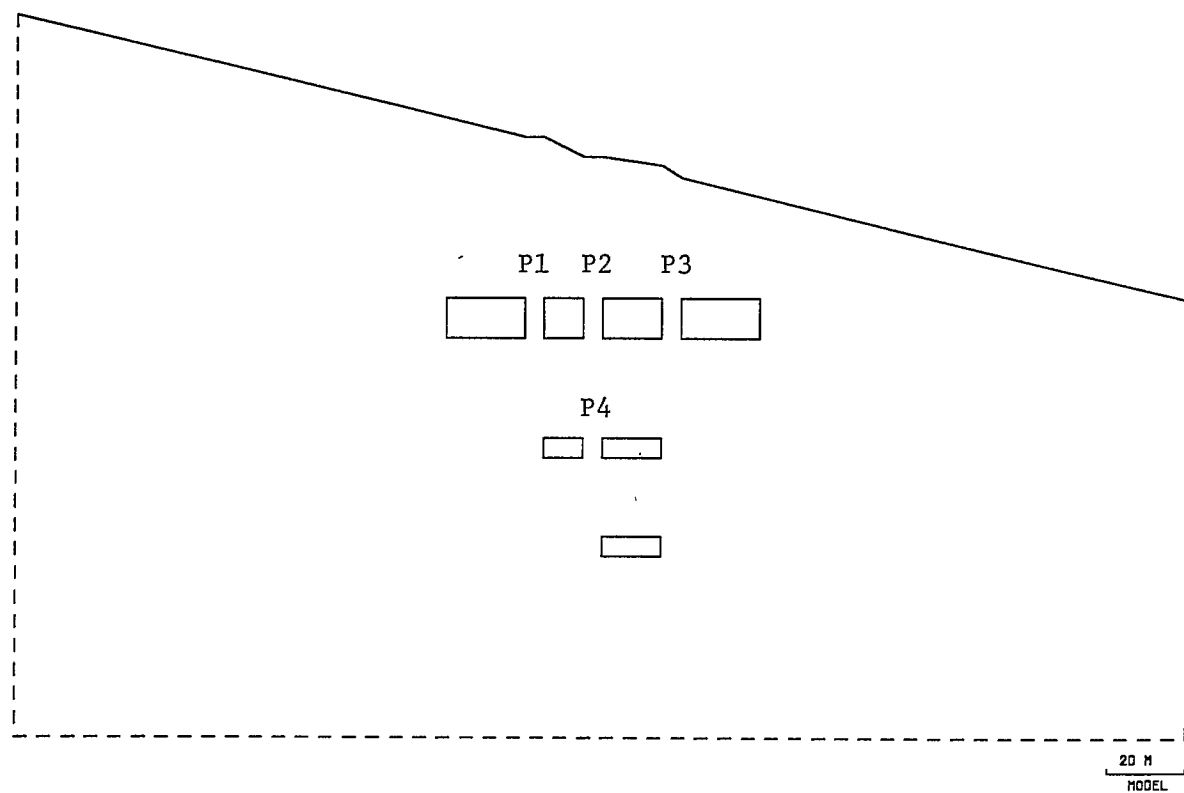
Sketch of Pillar Layout, Model 2, Section 19250E
